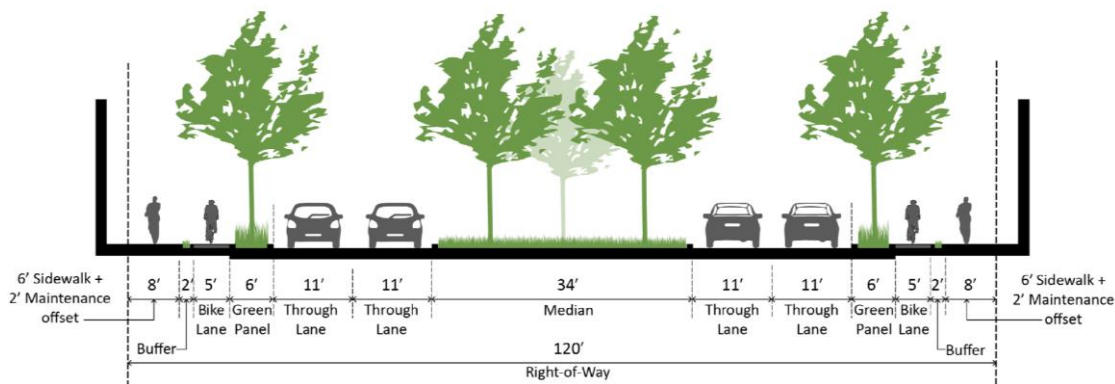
Lost Knife Road Cross-Section (4-lane section East of Montgomery Village Avenue, looking West)
